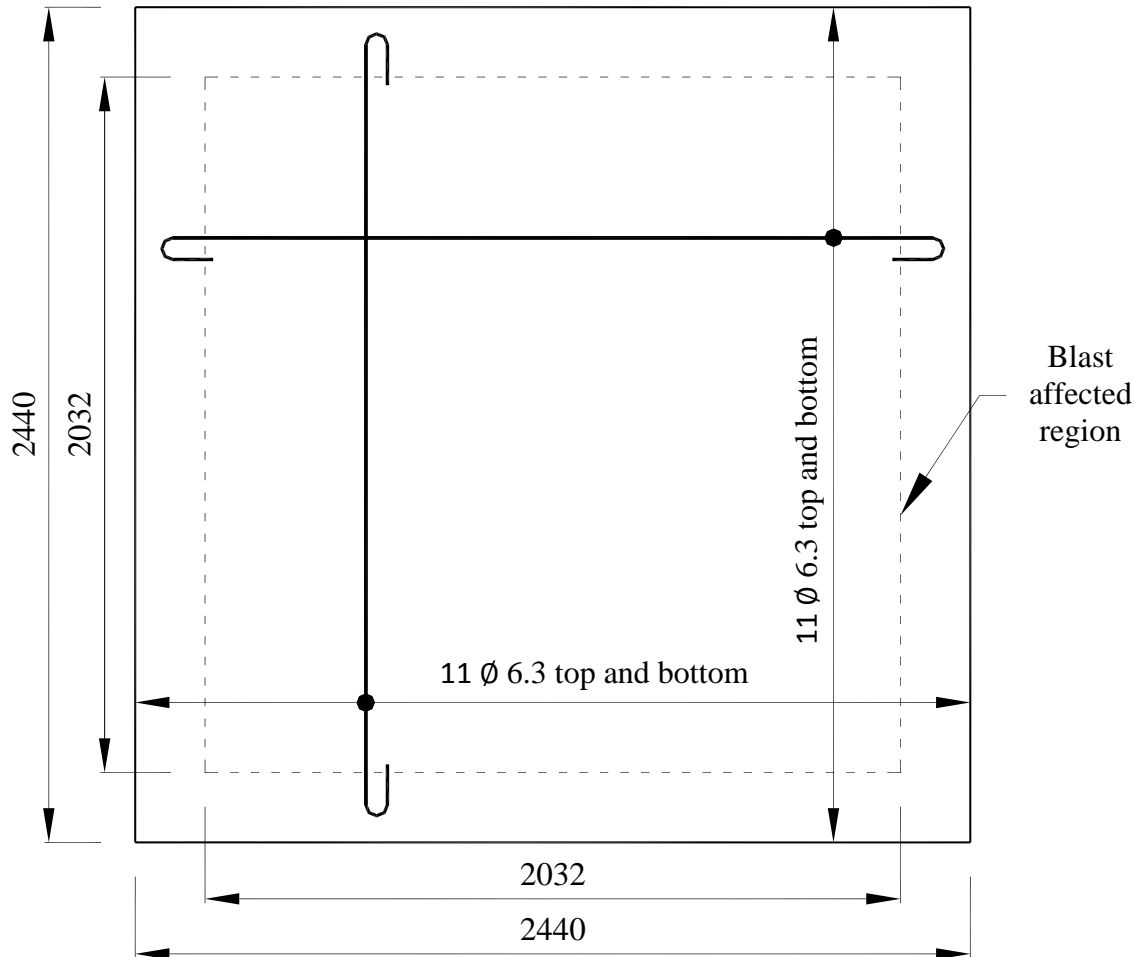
Jacques specimen CS5-C dimensions and reinforcement layout (dimensions in mm)
